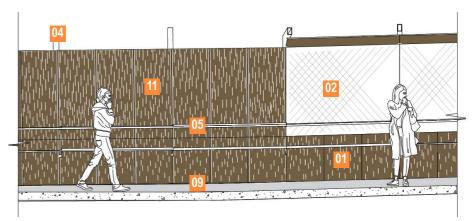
Falcon Street Active Transport Bridge -Elevation F 1:100
